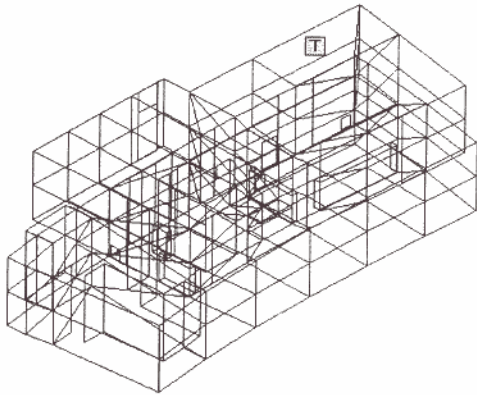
DICOM, floors -2 and -3 (34 m × 20 m).
